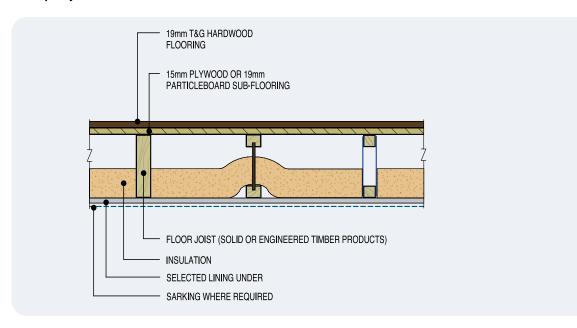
19mm T&G Hardwood flooring over 15mm plywood or 19mm particleboard to top of joists
